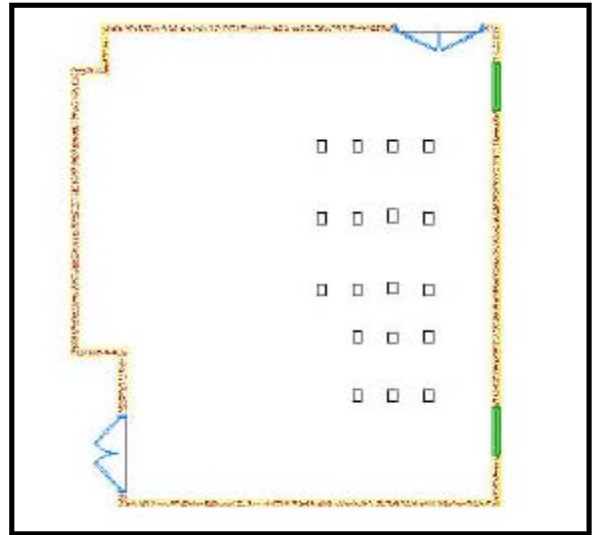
Location of power outlets and network connections in the floor of the CADD lab
